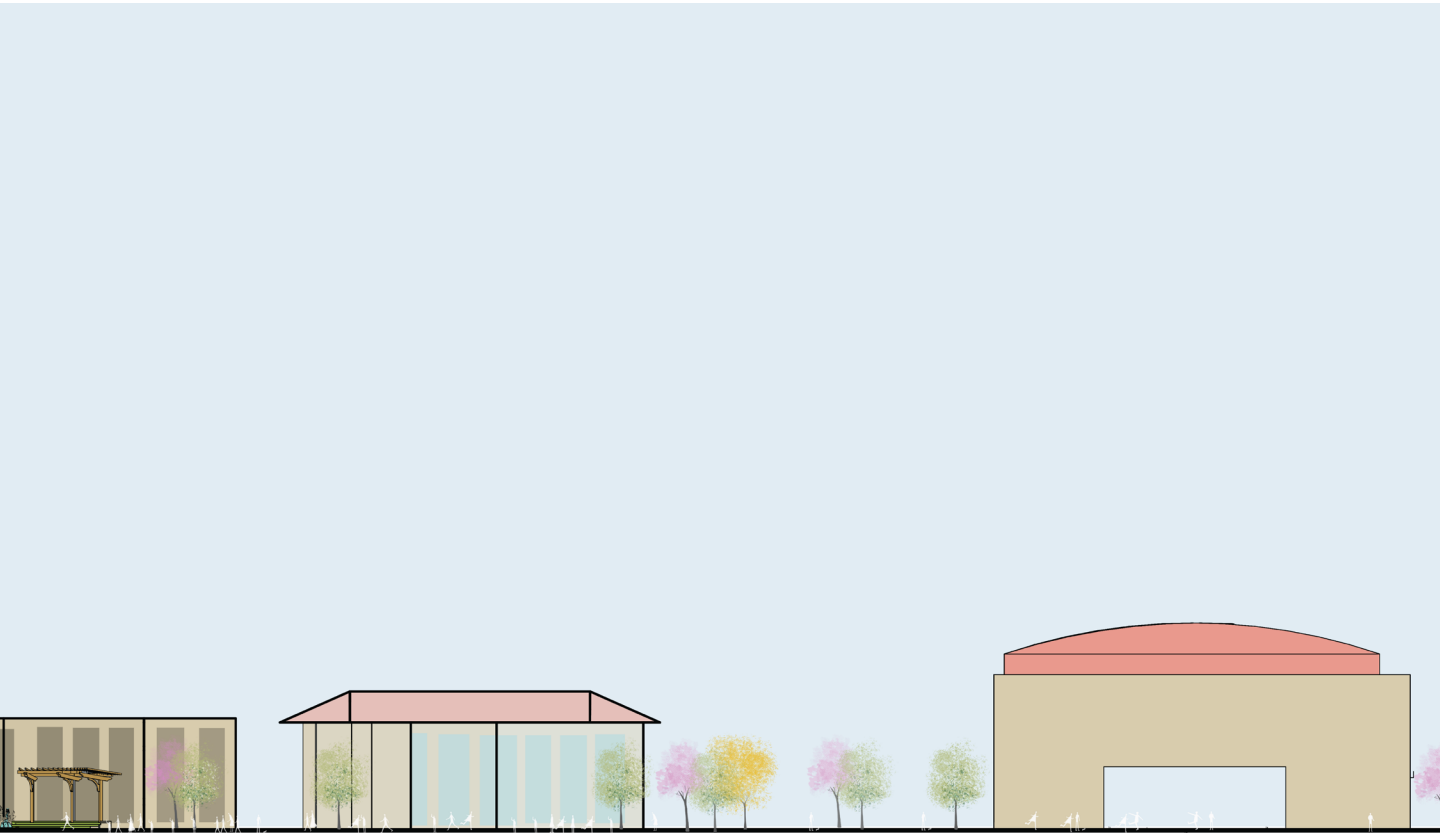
East-West Site Section of Kassab Mall Proposal.
